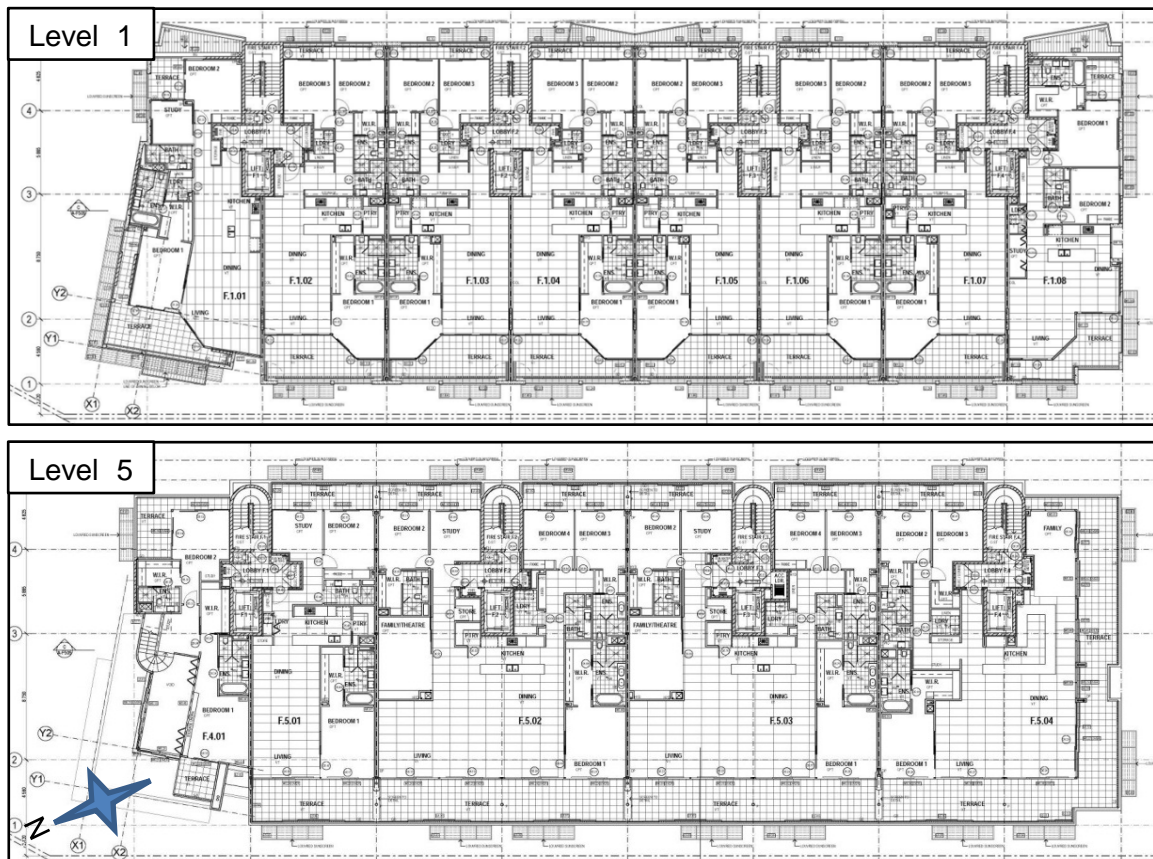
Levels 1 and 5 of the six storey apartment building
